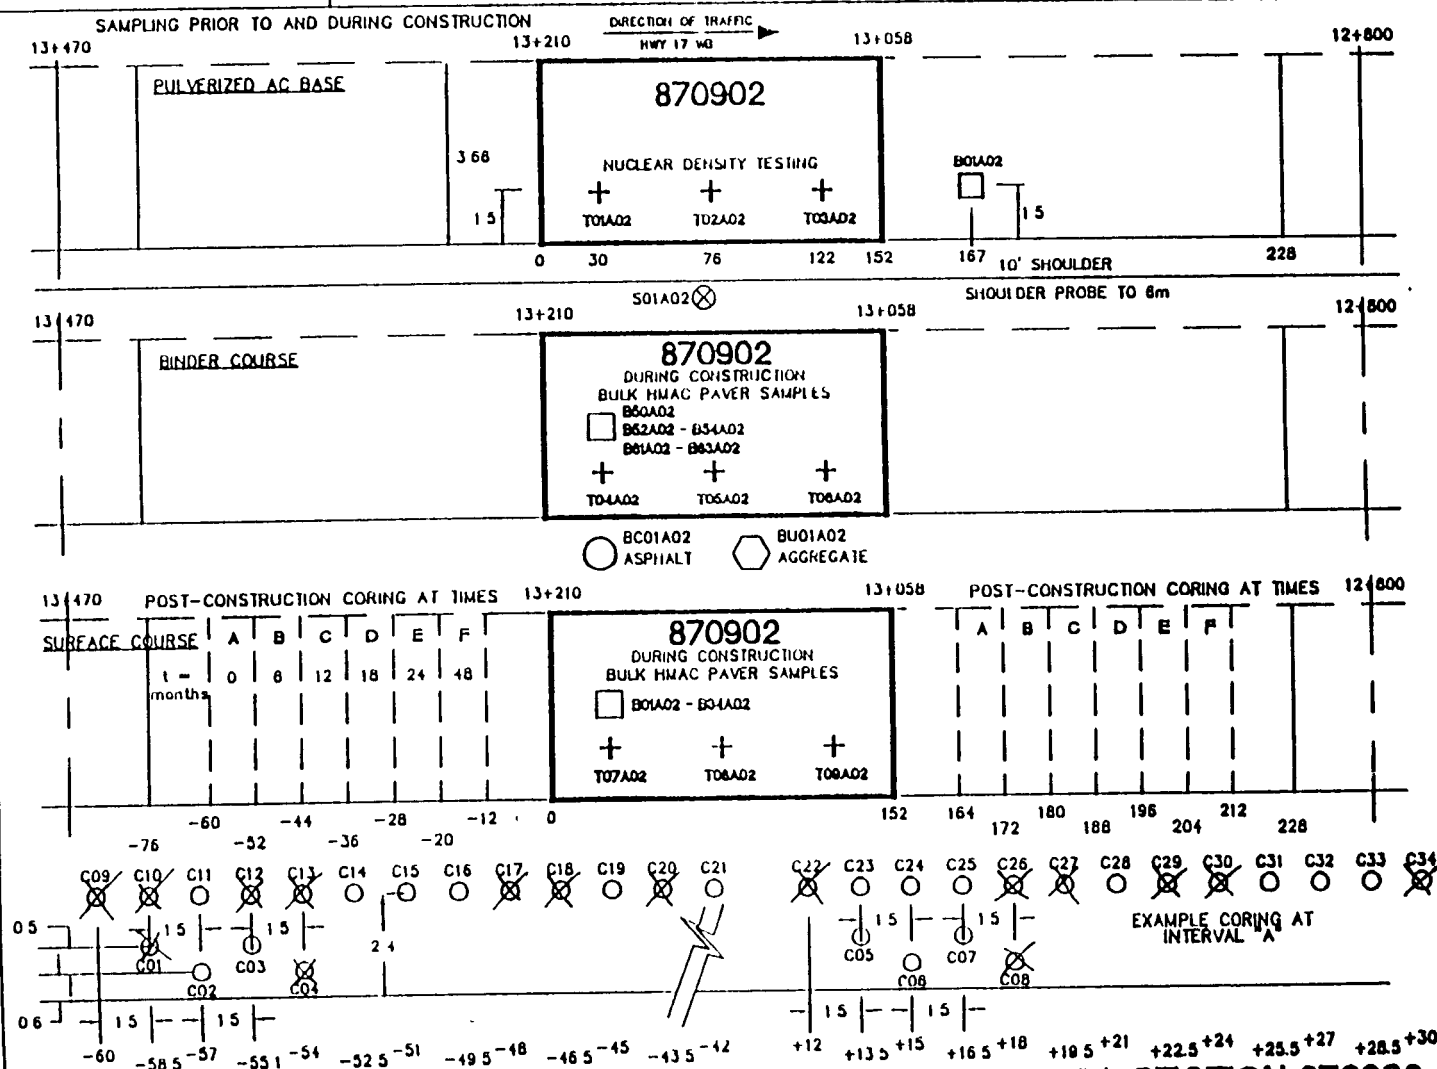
MATERIALS SAMPLING AND TESTING PLAN SPS-9A SECTION 870902
